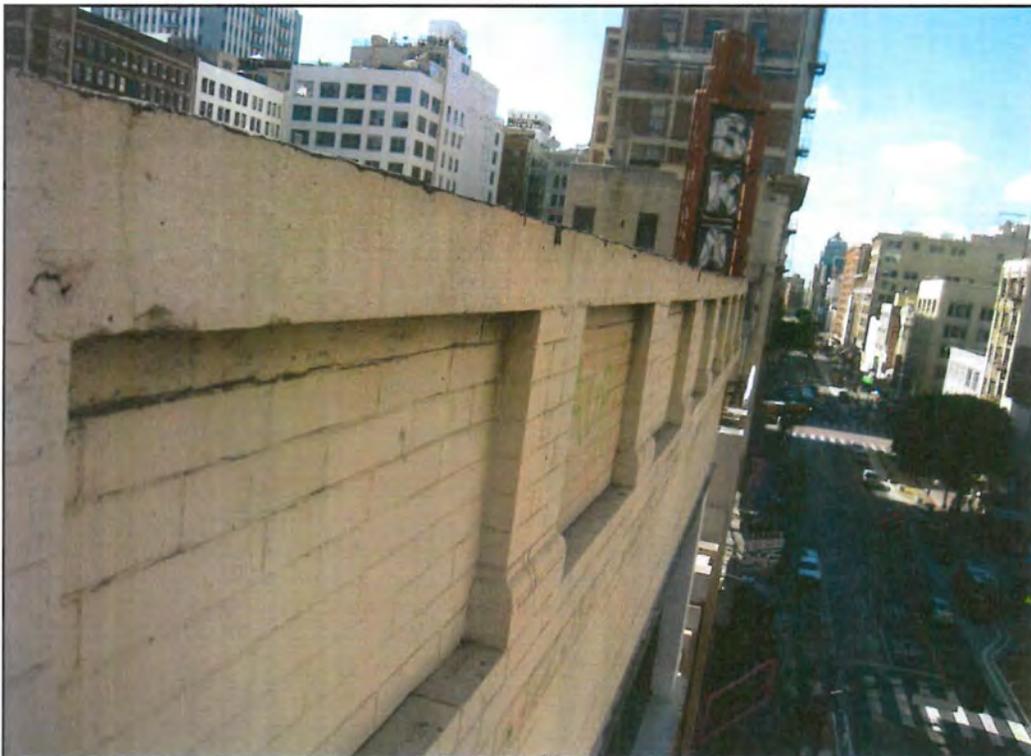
Detail of decorative brick roofline (Chattel, 2015).
